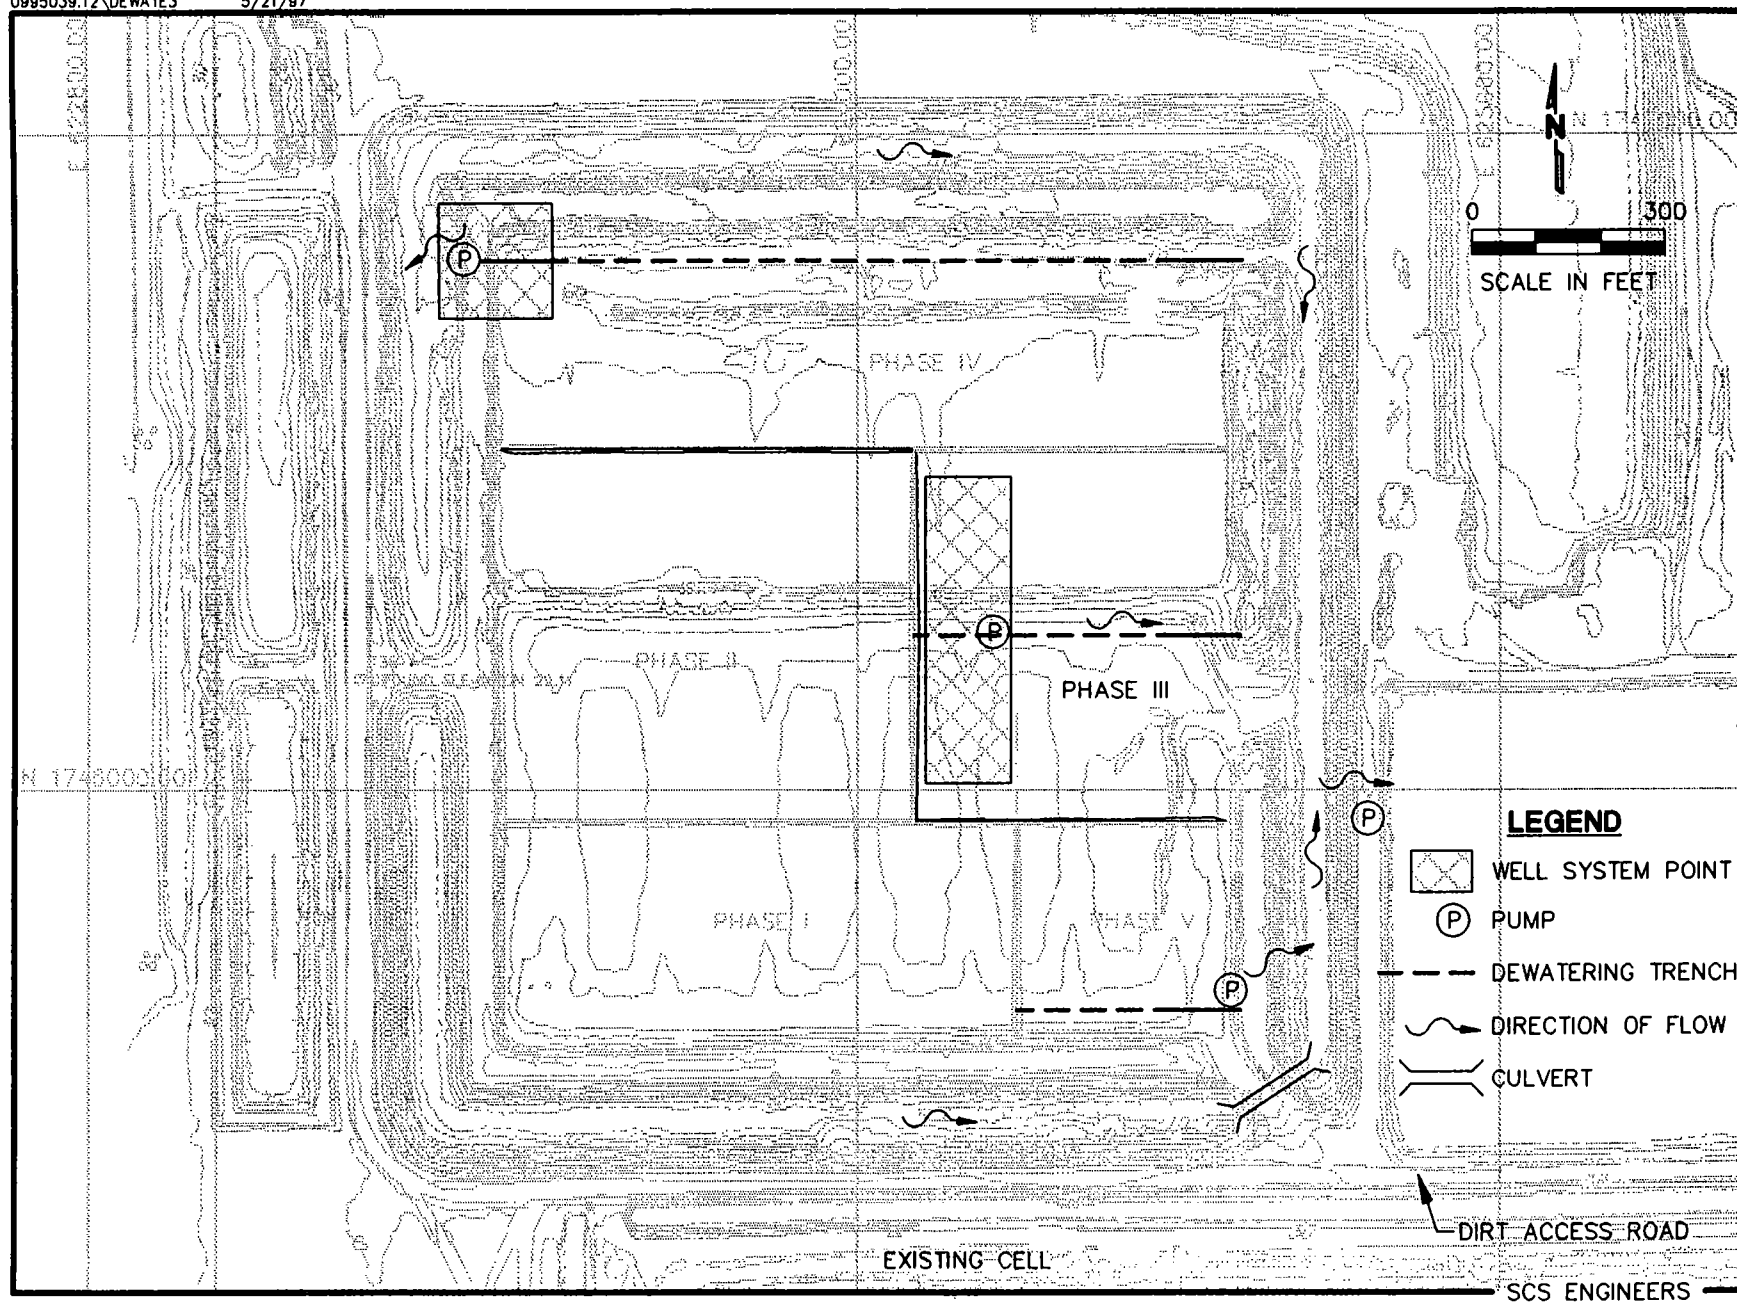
Step III Dewatering Plan (Site Conditions On 12/10/96).
